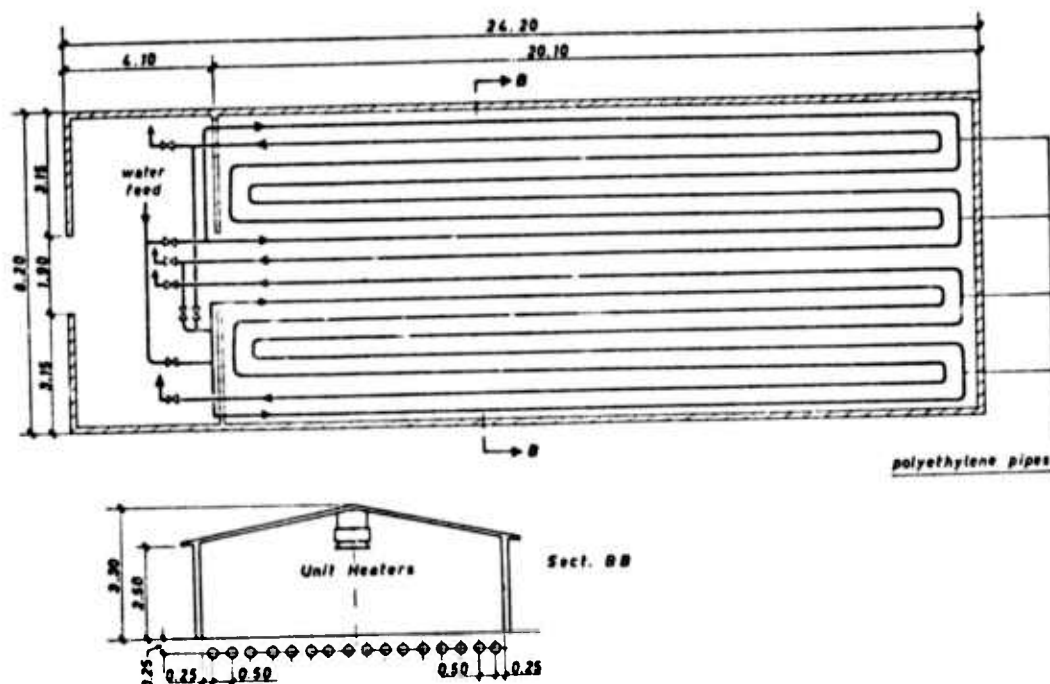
Layout of the underground heating pipes for a greenhouse (dimensions in m.) [133].
